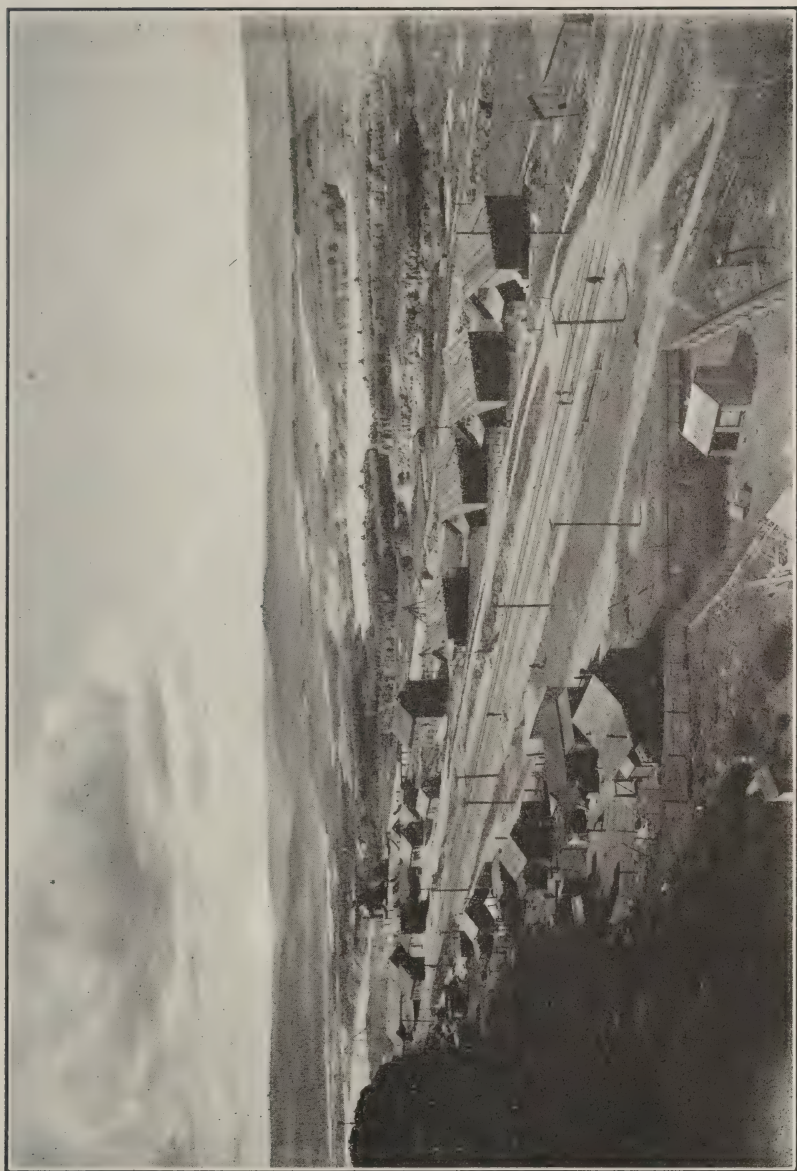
Government construction camp No. 1, Big Eddy, Oregon, looking downstream about due west. Note Mount Hood under the clouds. The line of the canal is just beyond the houses. Big Eddy is body of water in right center of picture, with Five Mile Rapids opening into it about 1 inch from right edge of picture.
